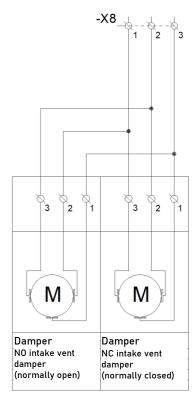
Connections circuit diagram for two dampers in the intake vent switching system.
